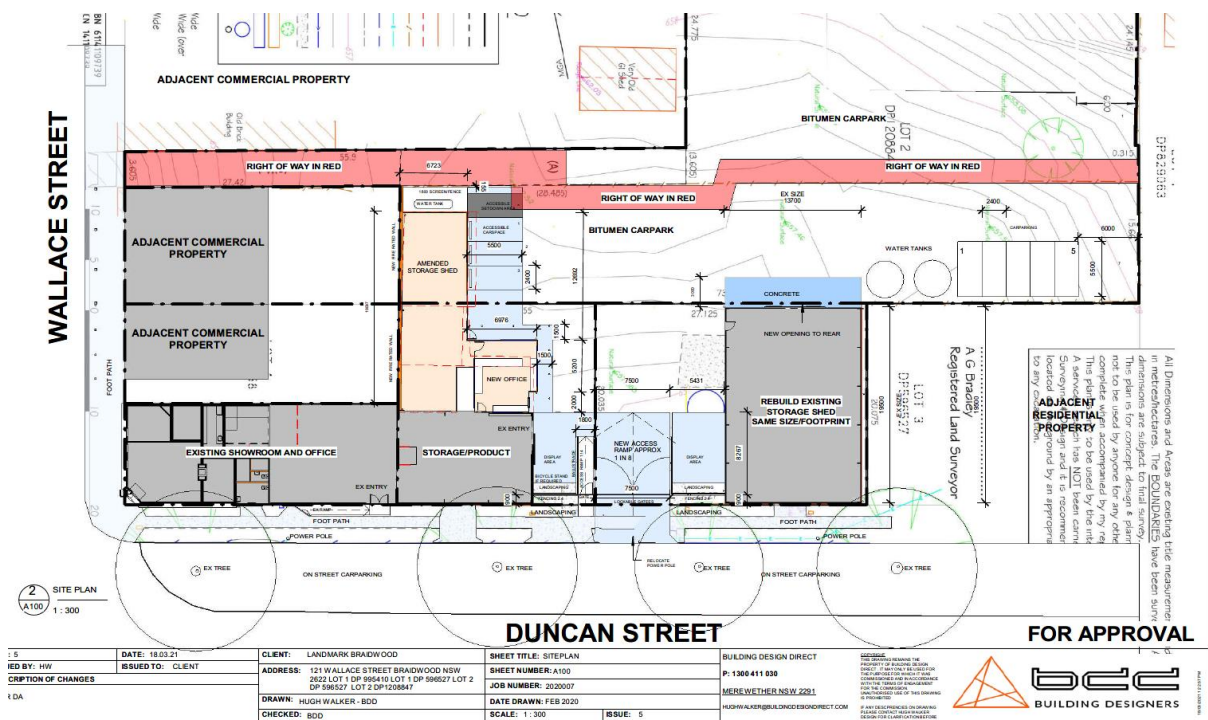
Proposed Amended Site Plan Under Section 8.2 Review
